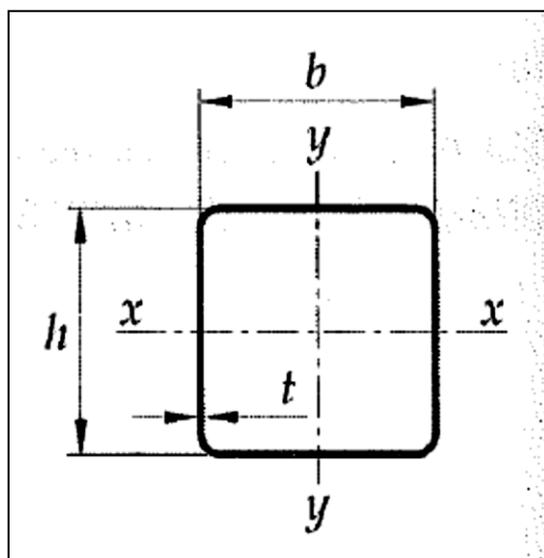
Rectangular hollow steel section (Parrott, 2005)
